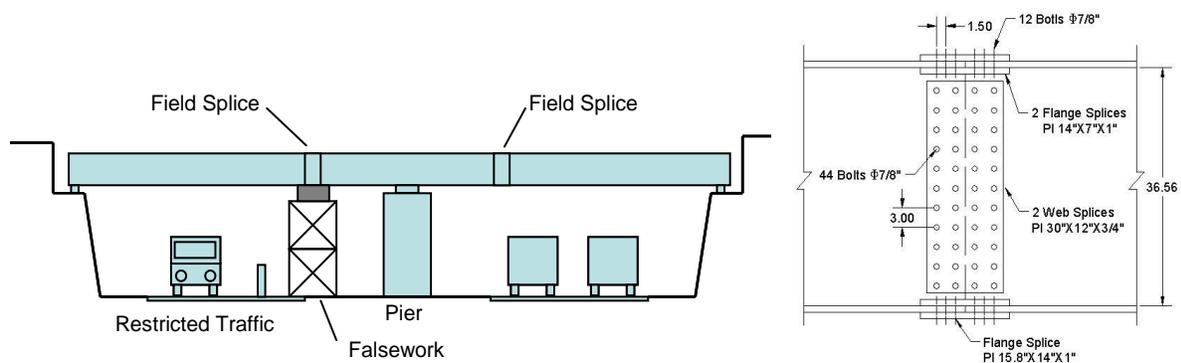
Conventional Two Span Continuous Bridge Girder and Typical Splice Detail
